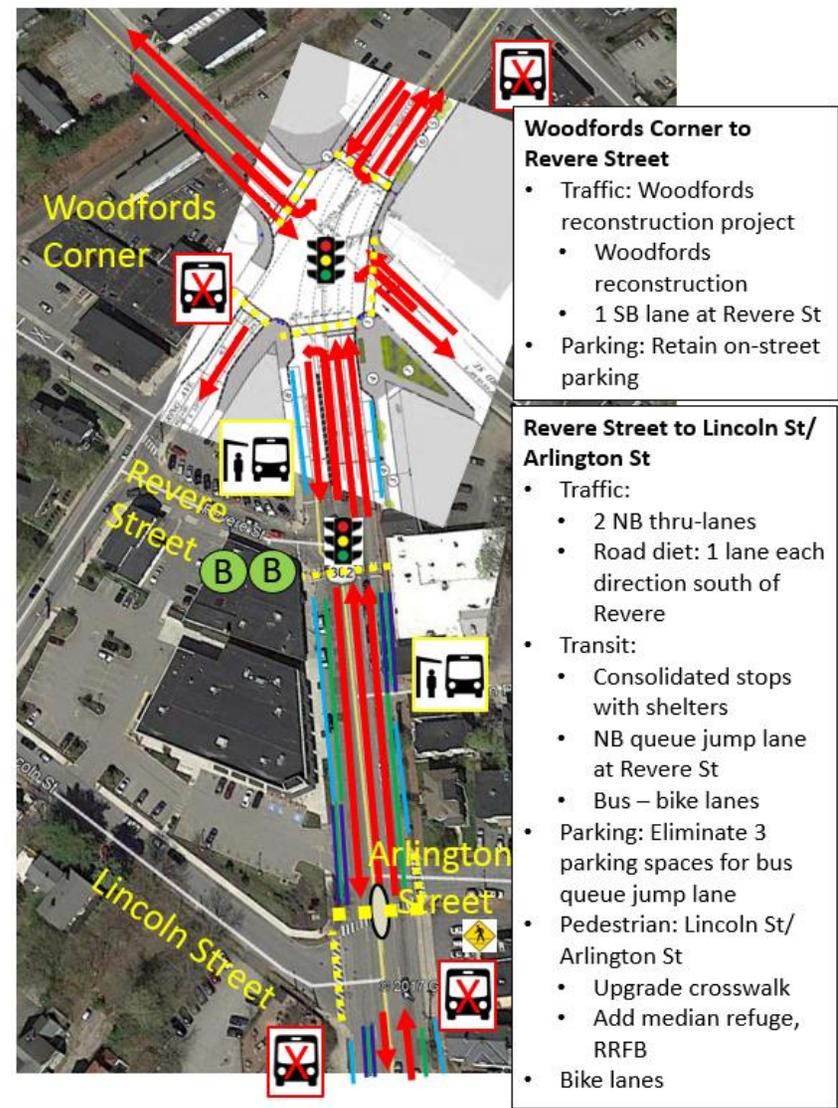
Woodfords Corner to Lincoln Street/Arlington Street – Alternative 2
